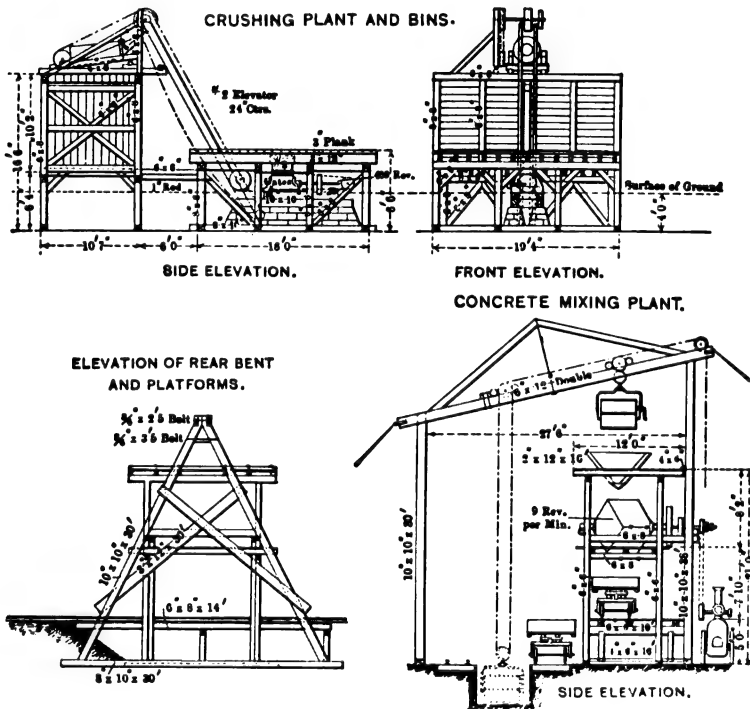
STONE CRUSHER AND CONCRETE MIXER, ILLINOIS AND MICHIGAN CANAL.
